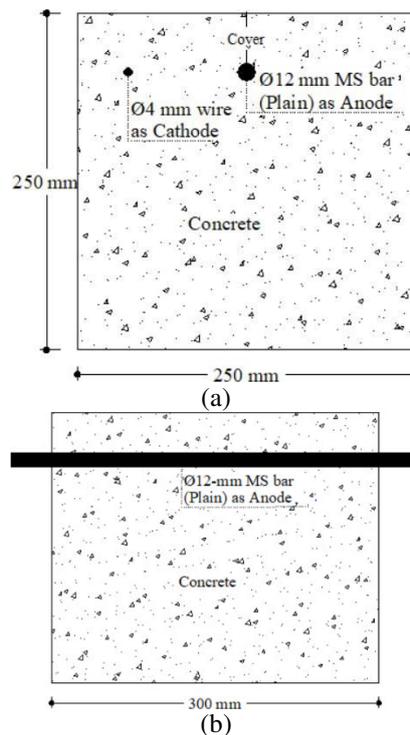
Details of Beam specimen (a) Cross Section (b) Longitudinal Section
